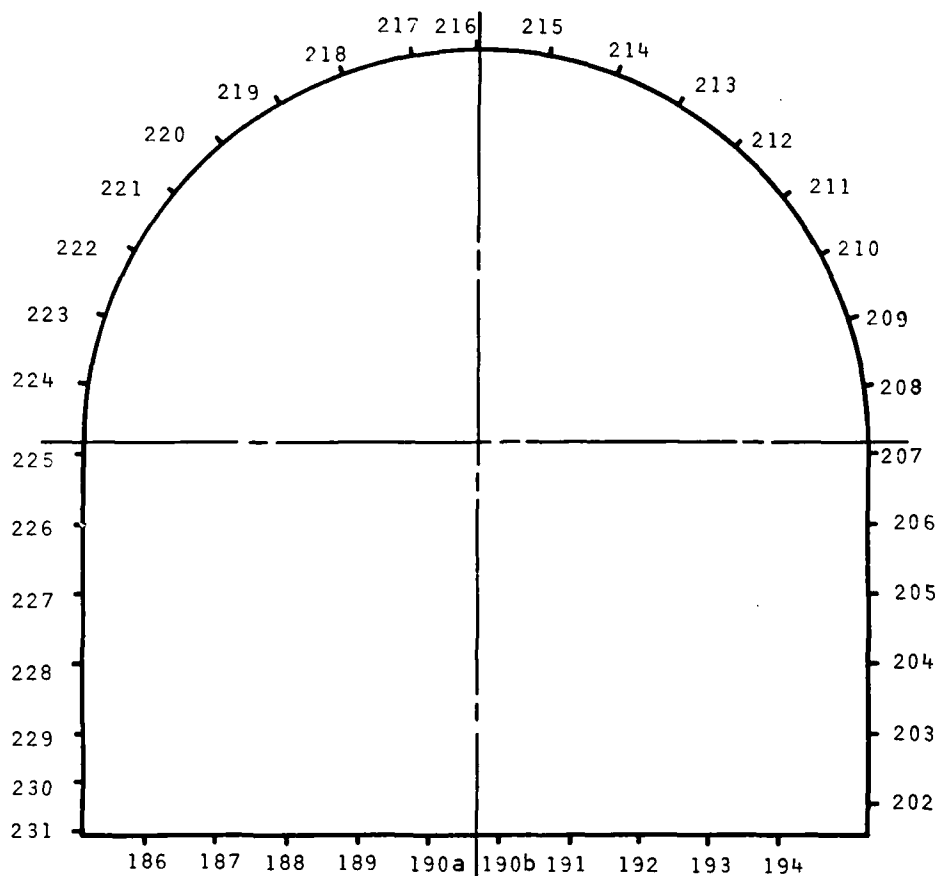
Passive gage point identification at Construction Station 6+08.
